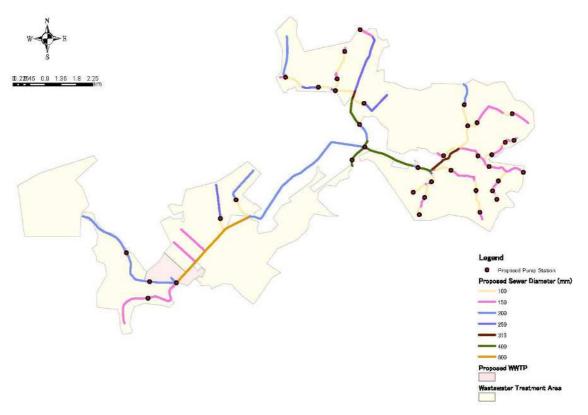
Plan of Sewer Pipelines (Sabeto Service Area (Nadi))
